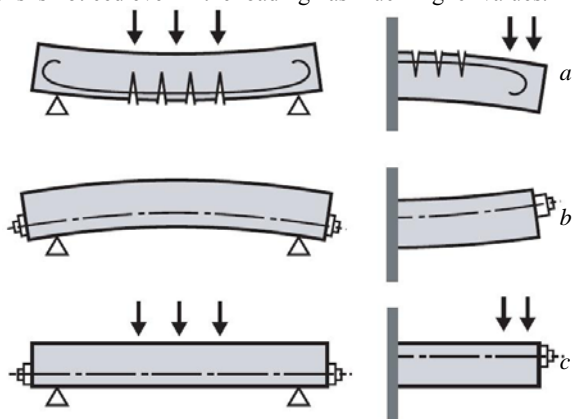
Behaviour of beams/plates of reinforced concrete and prestressed under load
